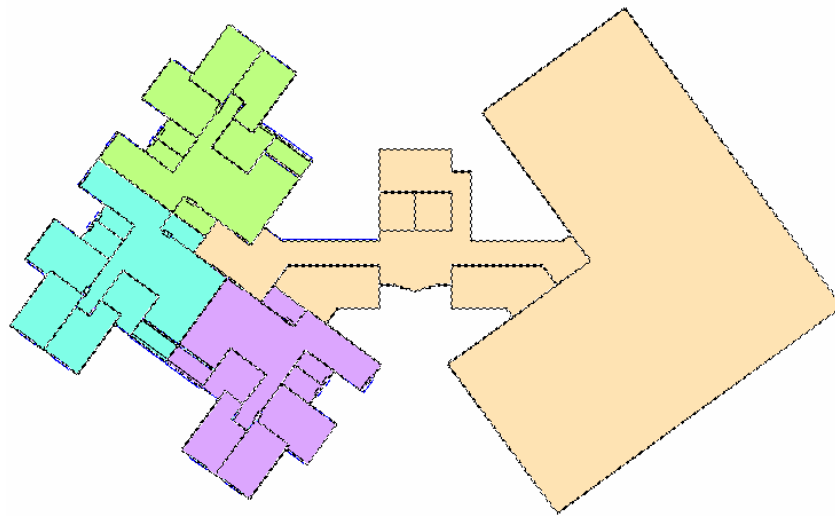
Floor plan and indoor layout of Jurong west Block 274C
